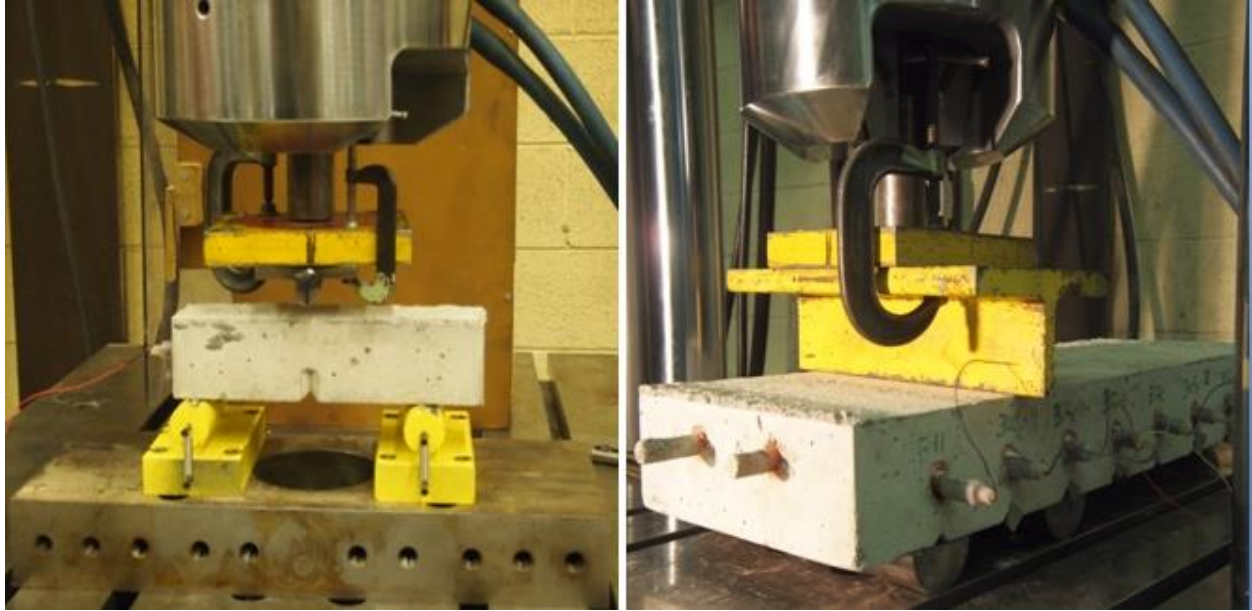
Inducing cracks in the transversely cracked (left) and longitudinally cracked beams (right).
